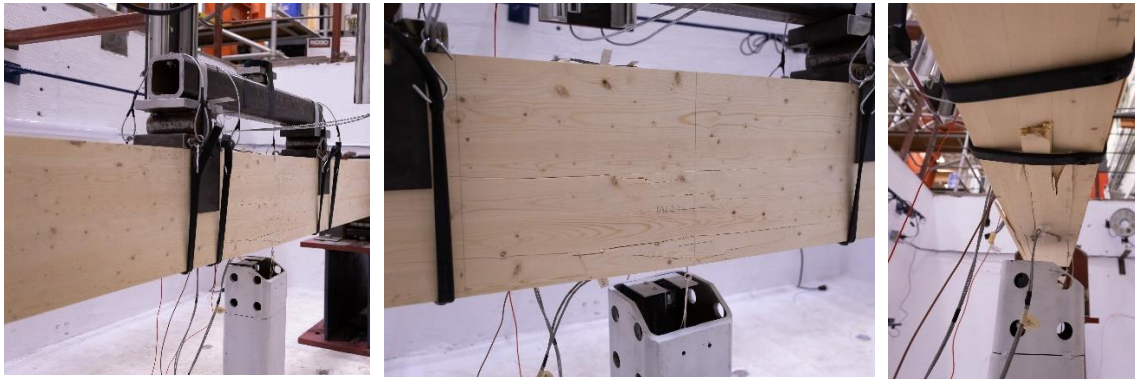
Failure of DN2-267, North side of beam, a close-in view and the bottom of the beam from left to right.
